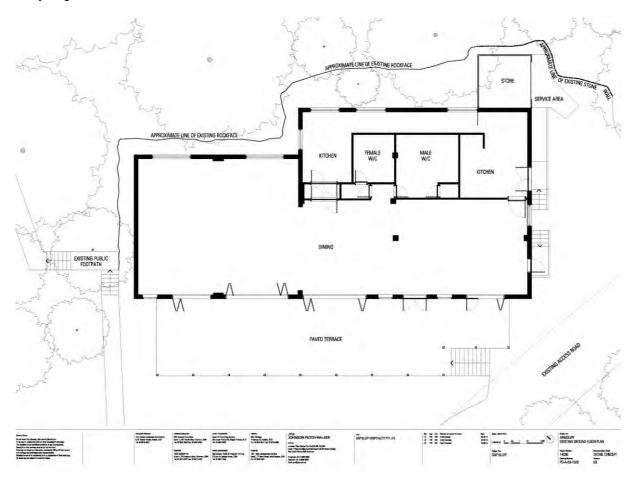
Floor plan, Armoury. (Source: JPW 2015)
